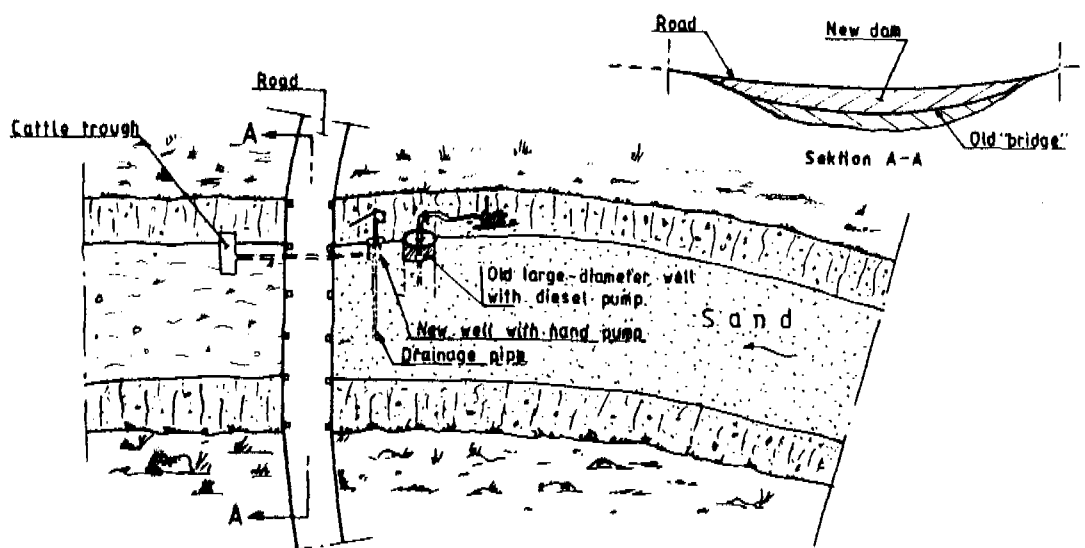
Plan and section of Mukio sand-dam site, Machakos.
